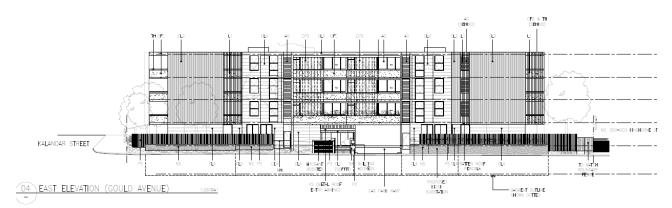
Elevation of the proposed development (eastern elevation - Gould Avenue).
